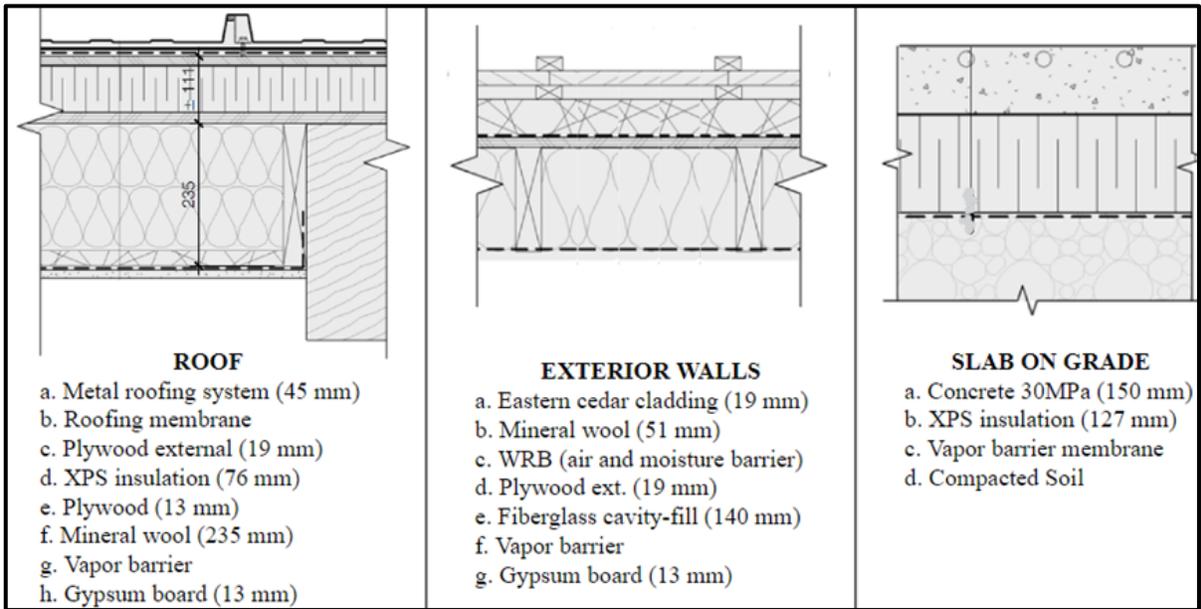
Typical sections of Future Buildings Laboratory envelope assemblies
